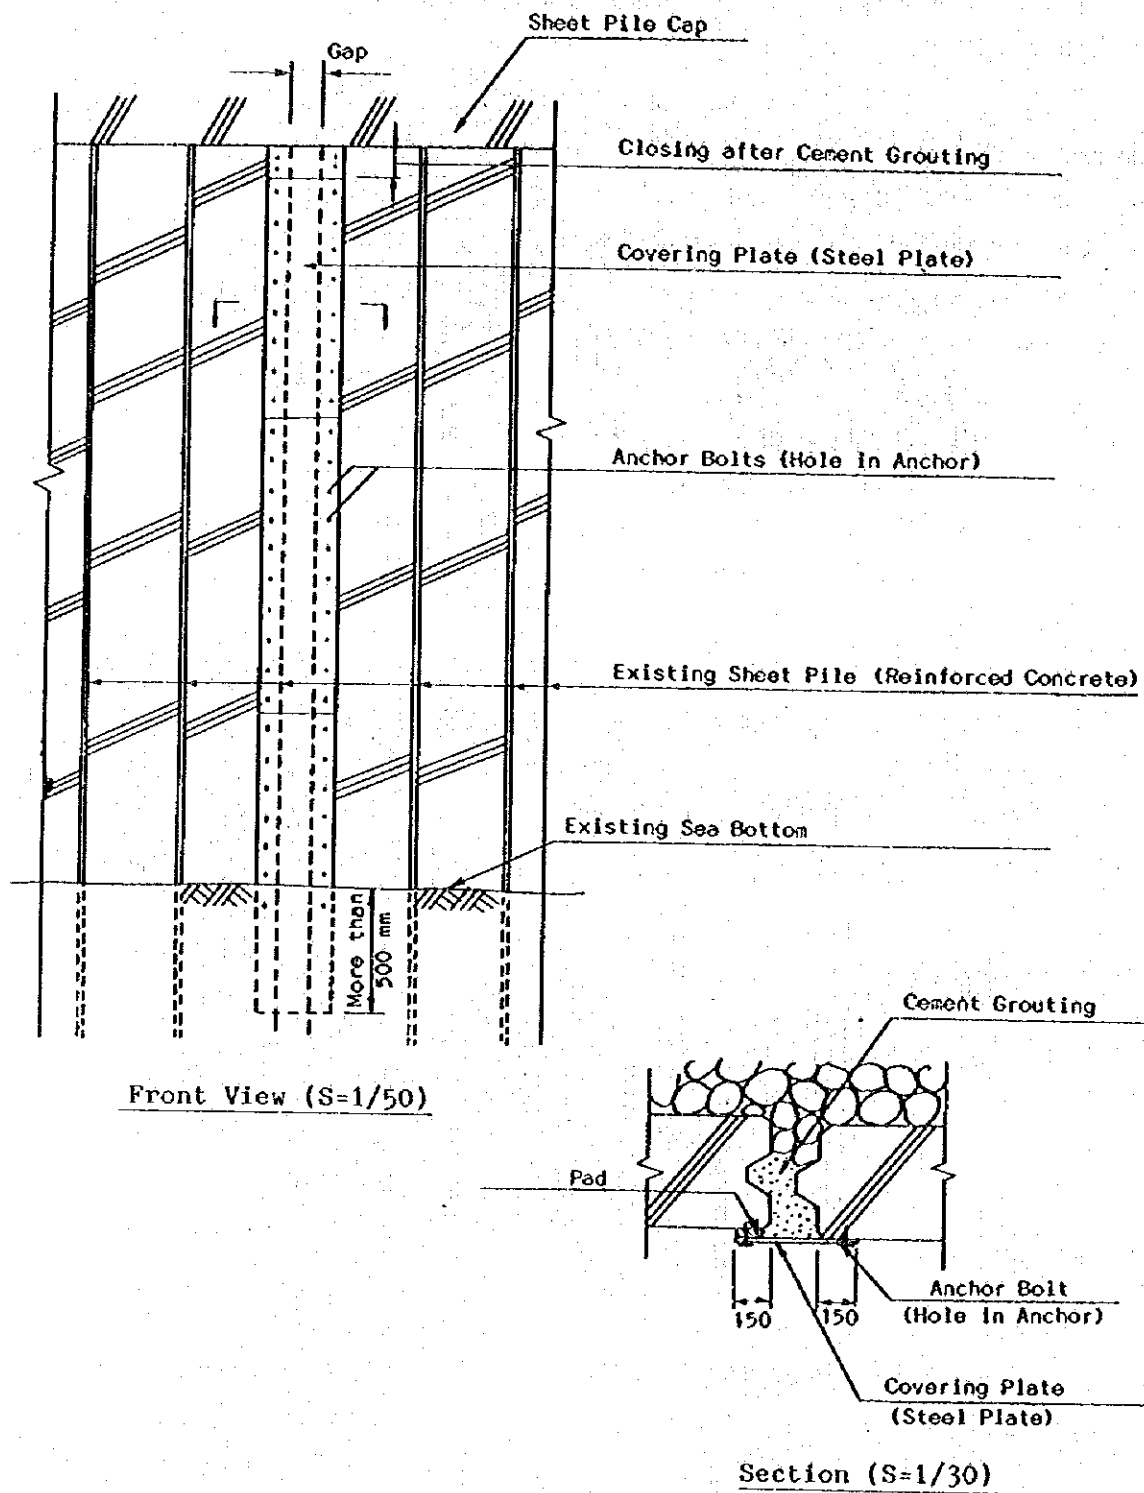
Proposed Renovation Works for Sheet Pile Gaps
